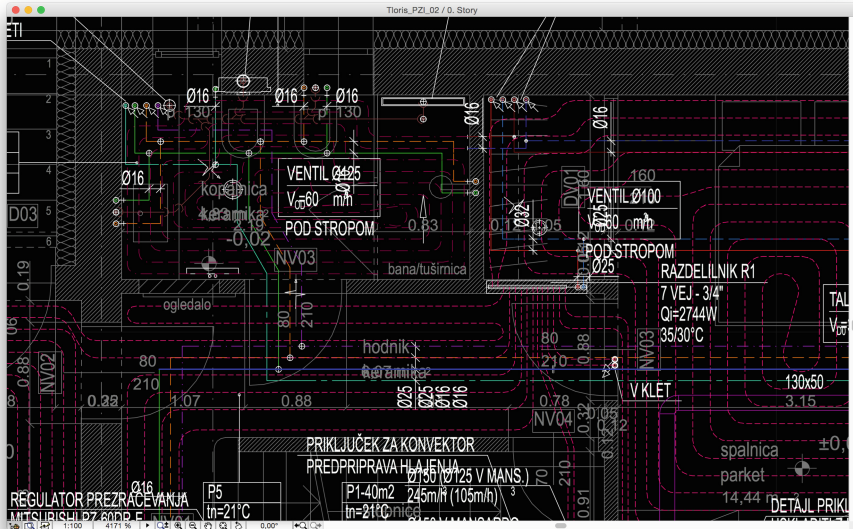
Heating, mechanical and plumbing floor plan: drawing primitives with implicit semantic [13]
